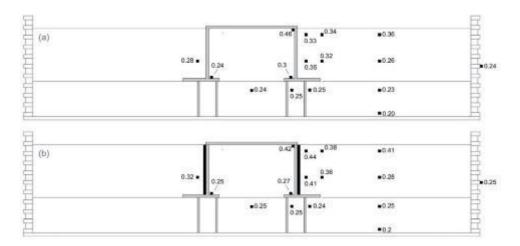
Maximum accelerations recorded by the sensors positioned in the backfill soil and on the bridge; comparison between two cases with piles connected to the foundation: without (a) and with (b) compressible inclusion layer behind the abutment wall (adapted from Fiorentino et al. 2019b)
